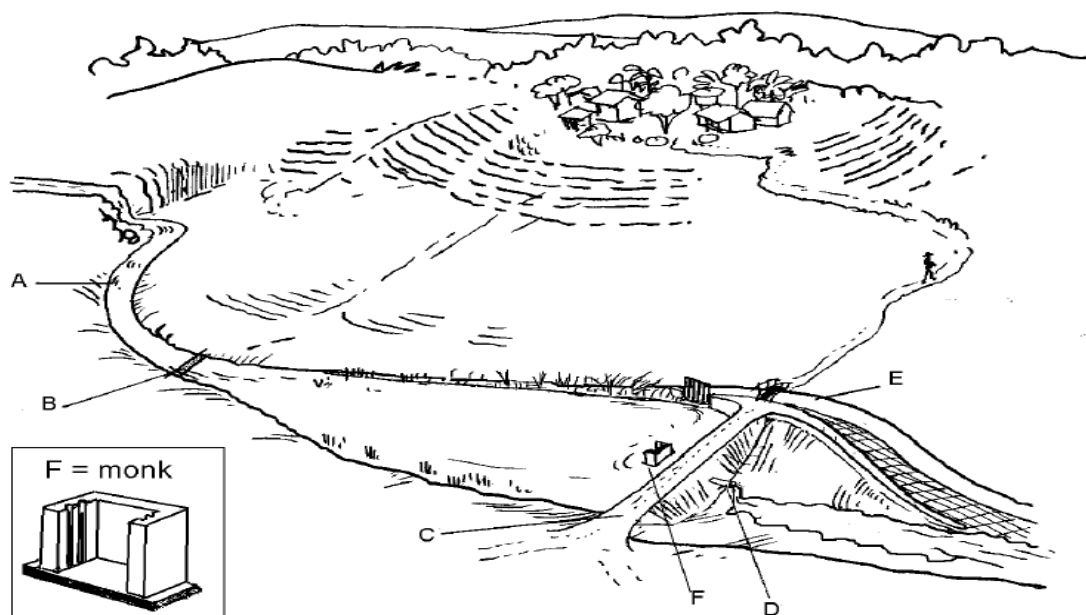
Barrage pond. A: stream, B: inlet, C: dam, D: outlet pipe, E: spillway and overflow, F: monk (One of the most common pond draining structures. It consists of a vertical tower with boards to regulate the water level; a pipeline to discharge the water; and a screen to prevent farmed fish from escaping the pond).
